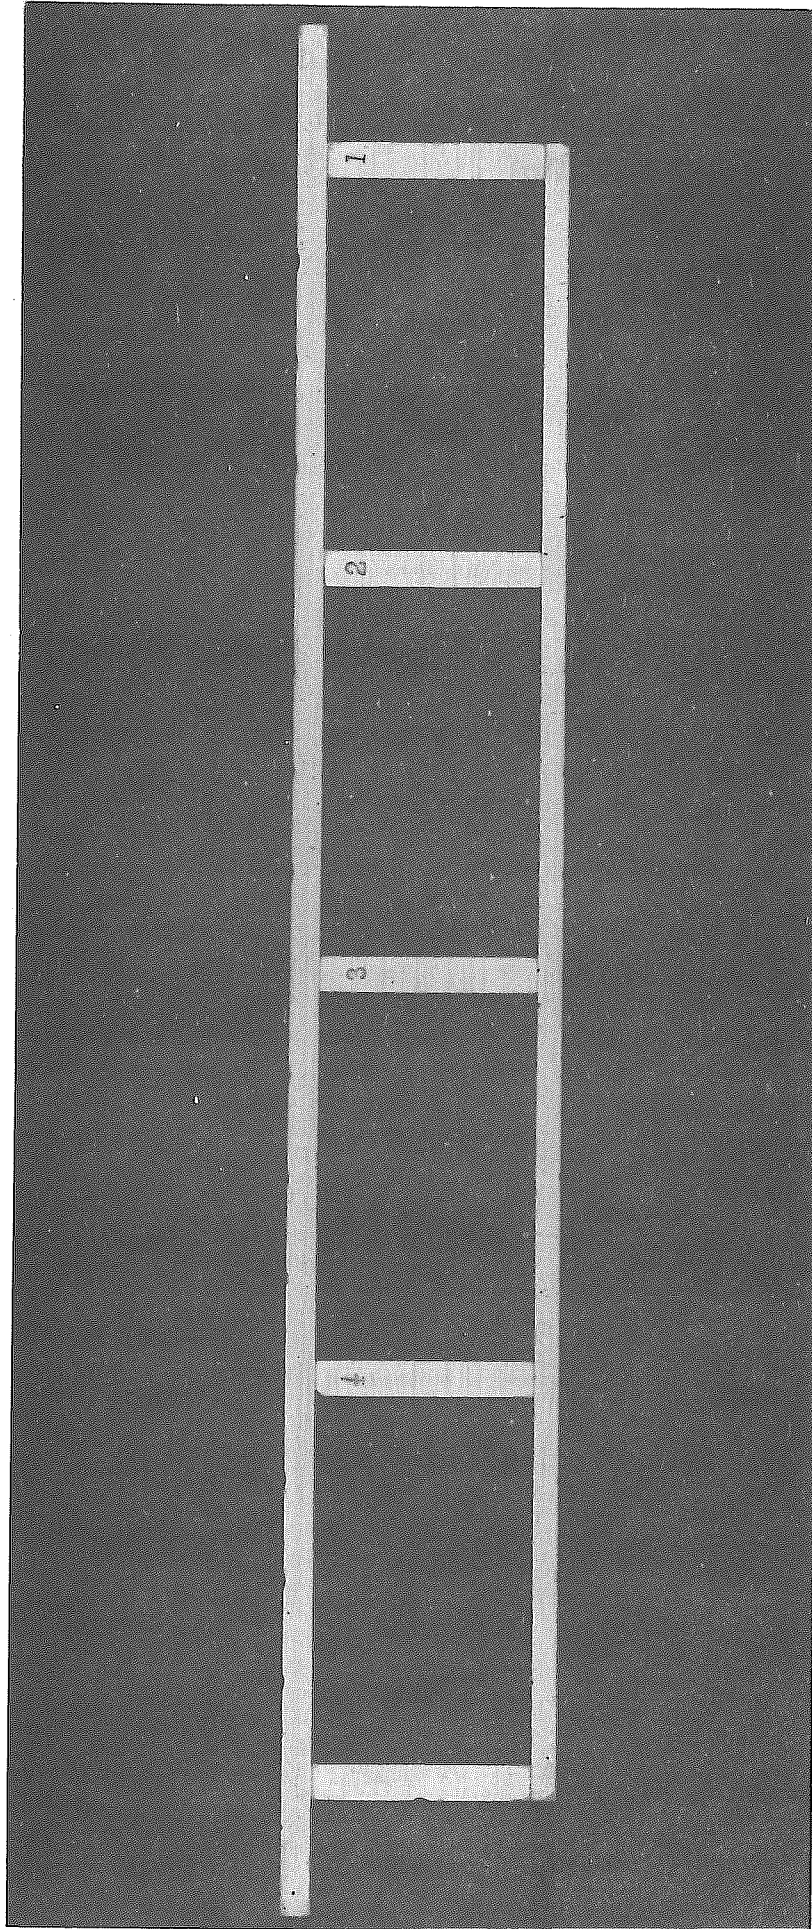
CROSS SECTION OF THE ALUMINUM BOX GIRDER BRIDGE MODEL
